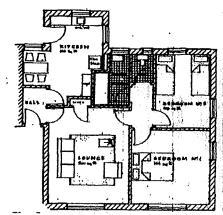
Griffith Flats floor plan Source: *Building Lighting Engineering*, March
